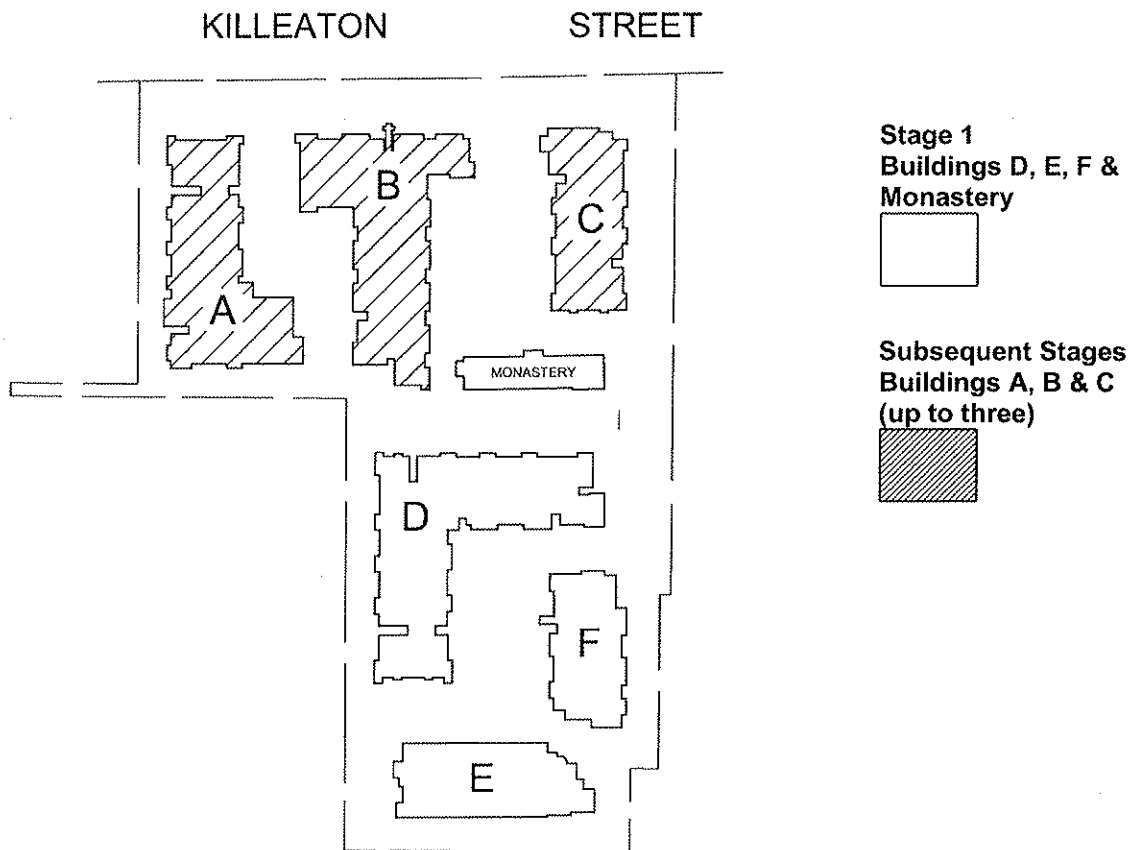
Site plan indicating footprints of the approved buildings and proposed staging
